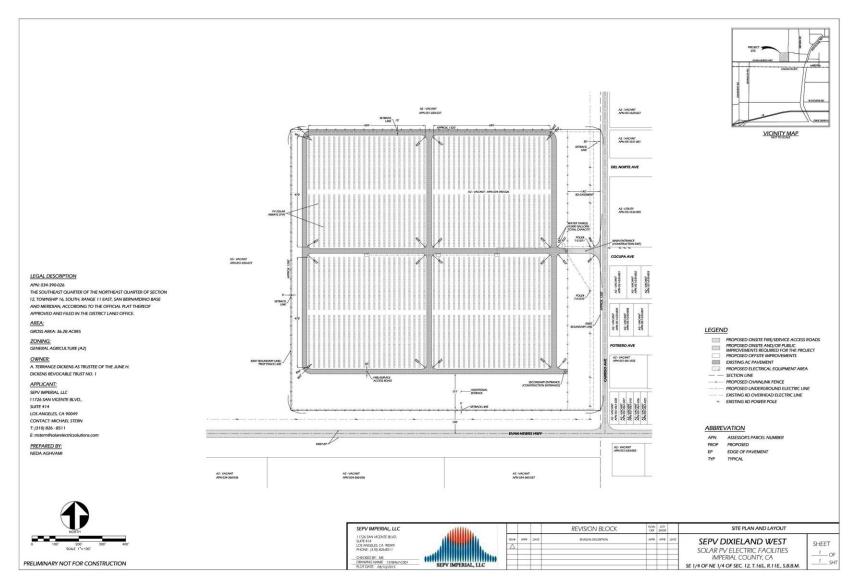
SEPV DIXIELAND WEST PROJECT SITE PLAN
